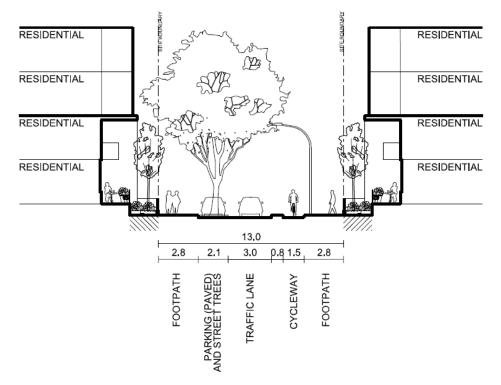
Section F – Local Street Type 3 Typical Section – 13m (Hatbox Place)
